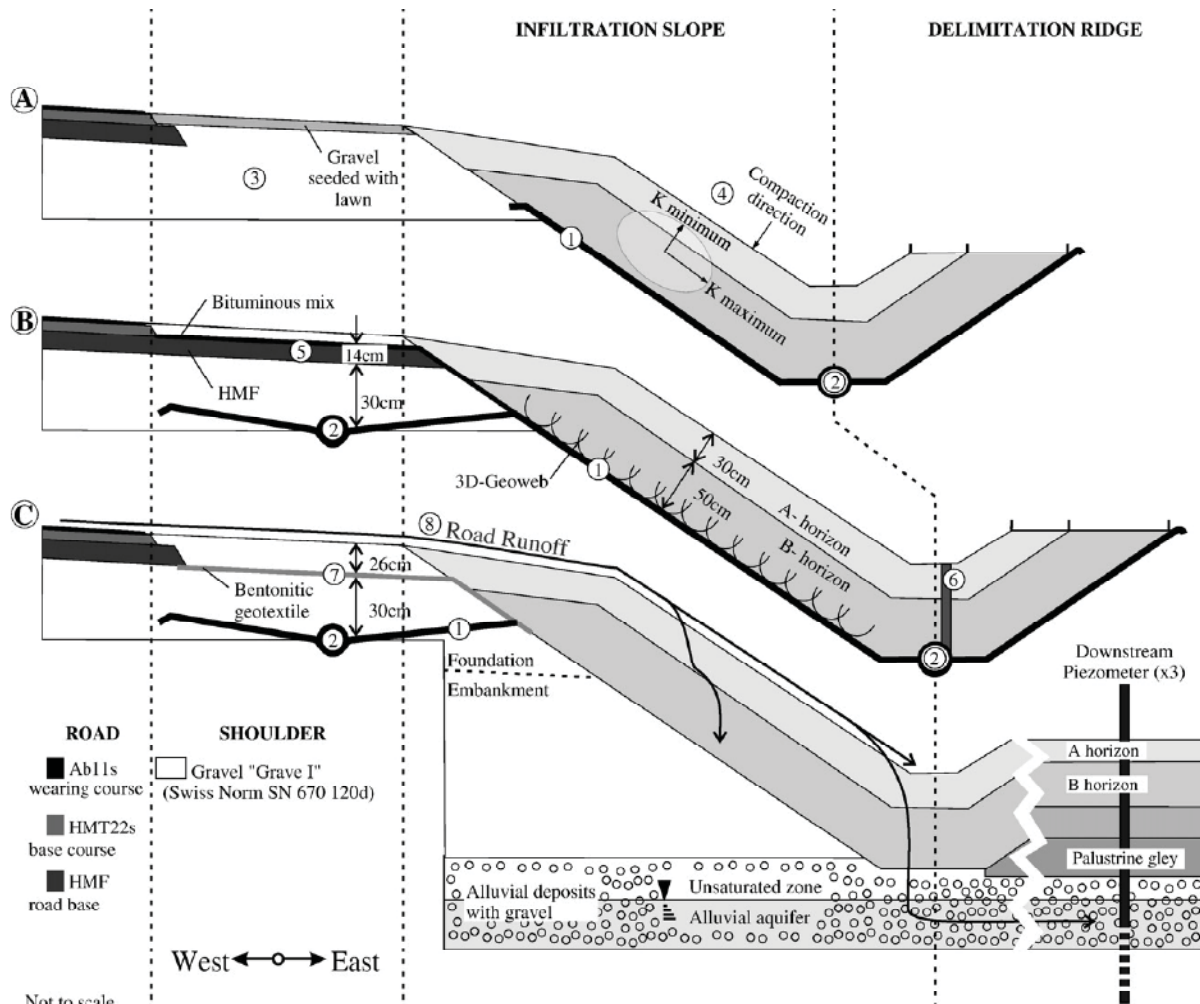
Infiltration slope cross-sections. (Piguet, Parriaux & Bensimon 2008)
